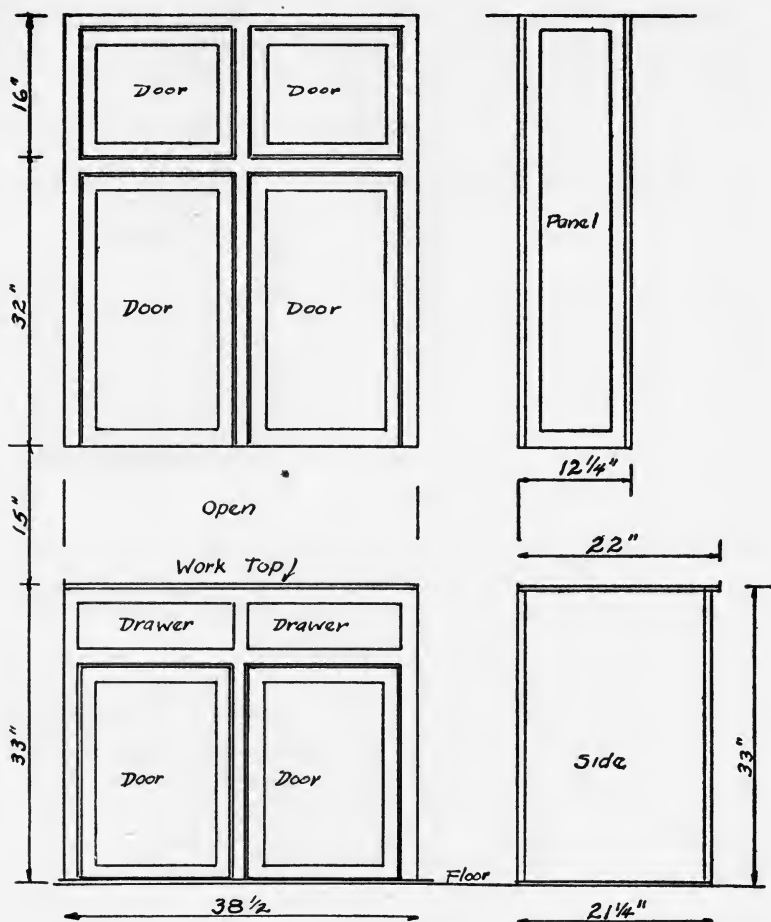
Elevation views showing double base and wall cabinets, typical of the principal built in kitchen case, but constructed according to the standard measurements.
